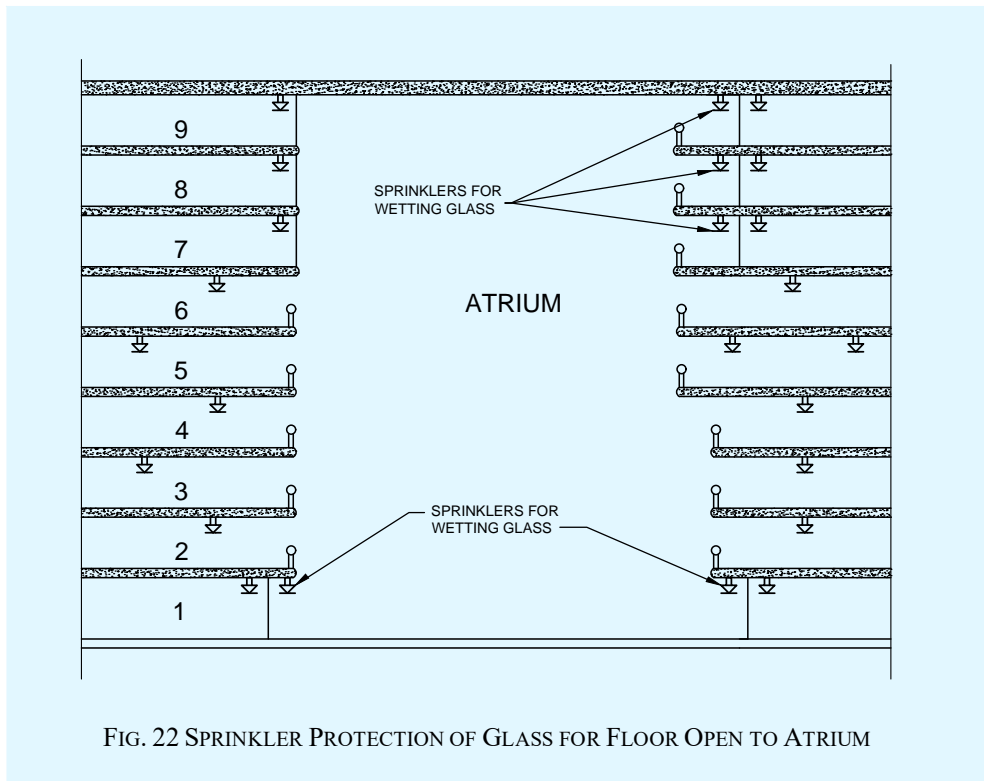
SPRINKLER PROTECTION OF GLASS FOR FLOOR OPEN TO ATRIUM
